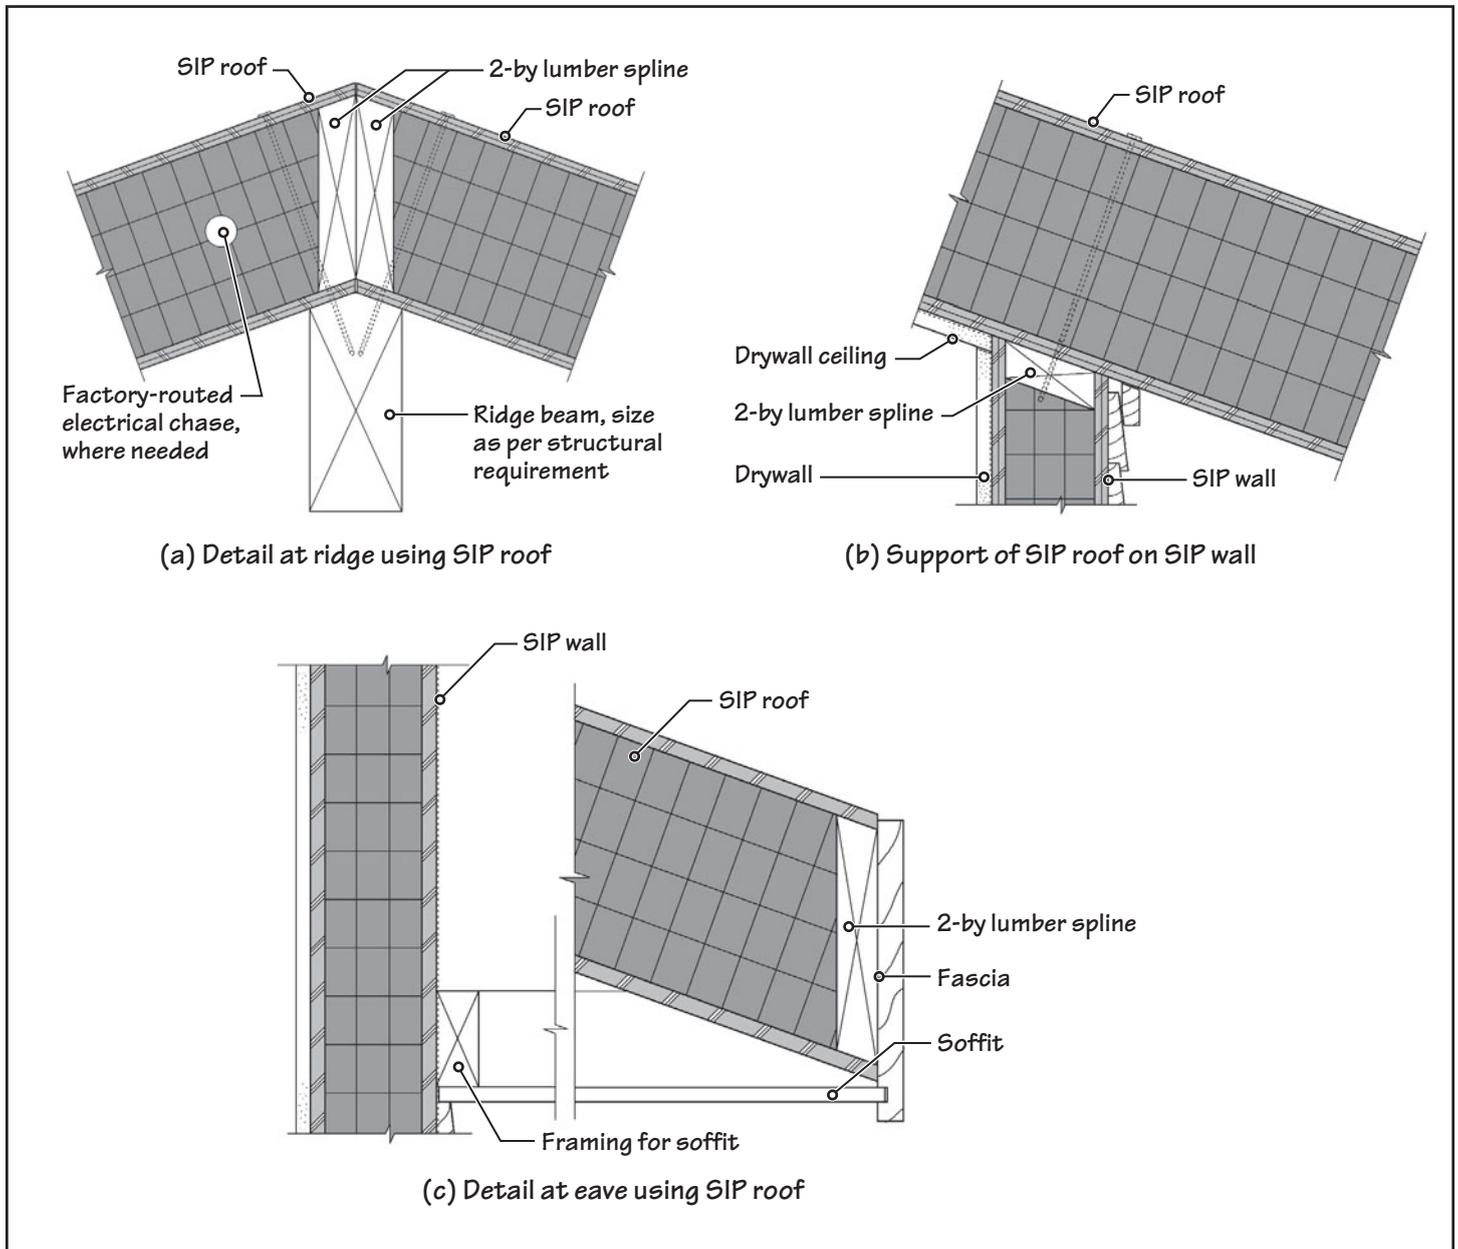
Details at the ridge and eave using roof and wall SIPs.
